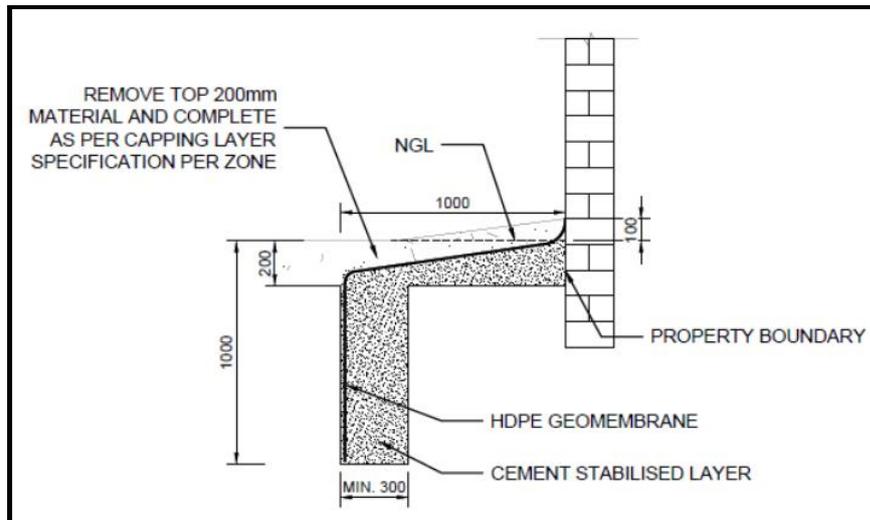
Typical cross-section of proposed rodent barrier (source: Walters, 2020)
